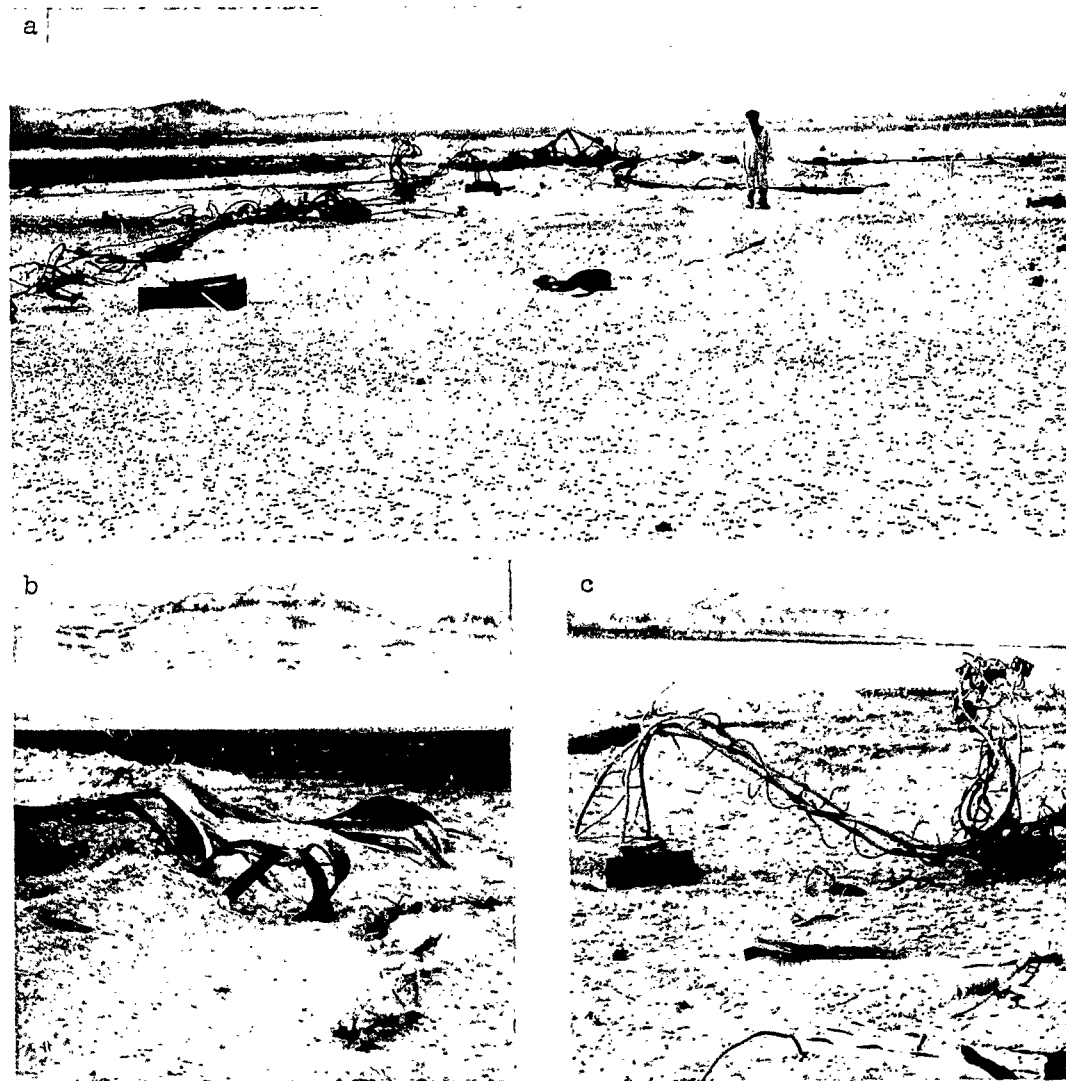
Shot 12 Tower Wreckage. (a) General View; (b) Top End of Tower Leg; (c) Close-up View of TV Tower.
